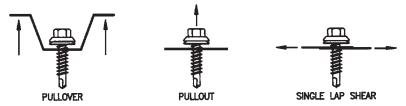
Various failure mechanisms for screw-type fasteners. (MBMA.)
